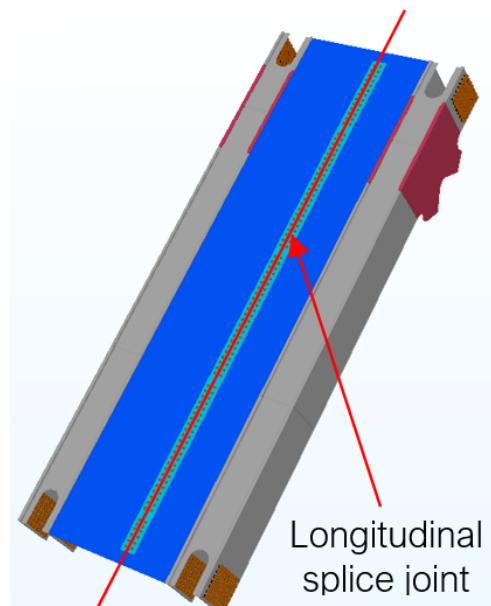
Bottom chord non-split segment and top chord split segment with longitudinal splice joint
